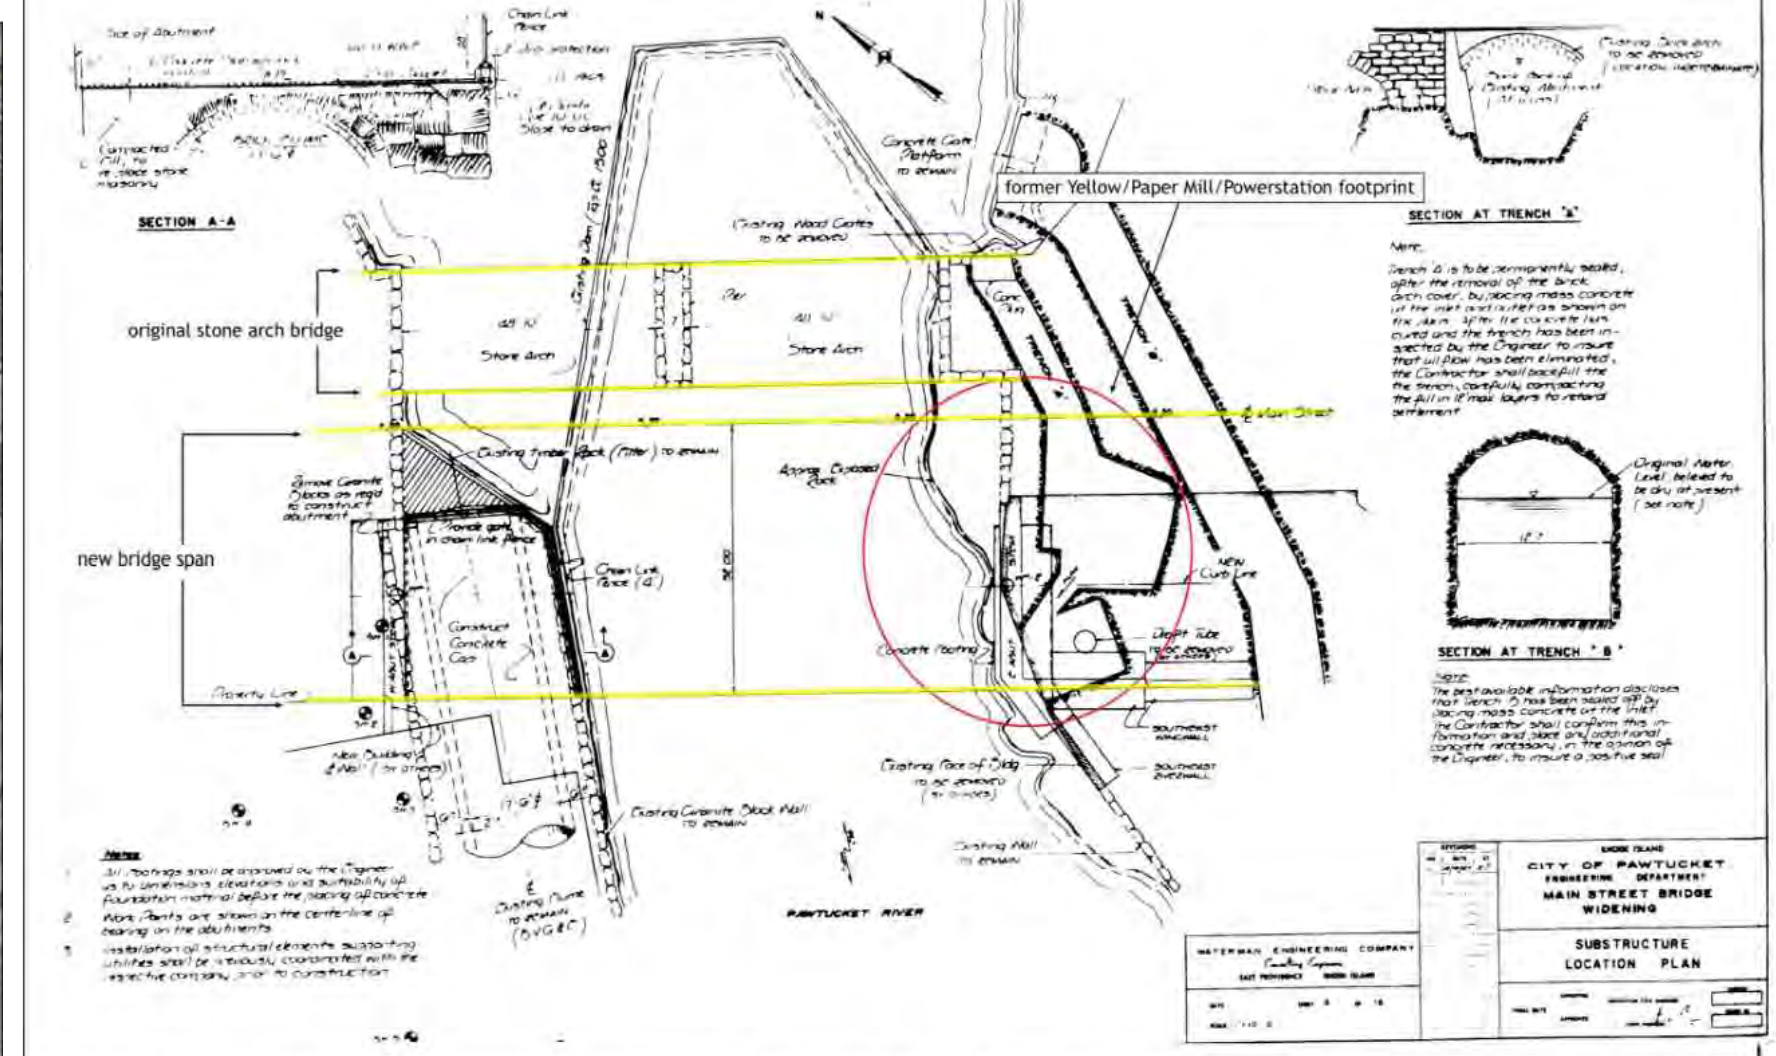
1967 (Waterman Engineering Company) Substructure Location Plan for the Main Street Bridge widening showing the existing conditions within the Project area. Note the location of the trenches and the cross-sections (at right).
